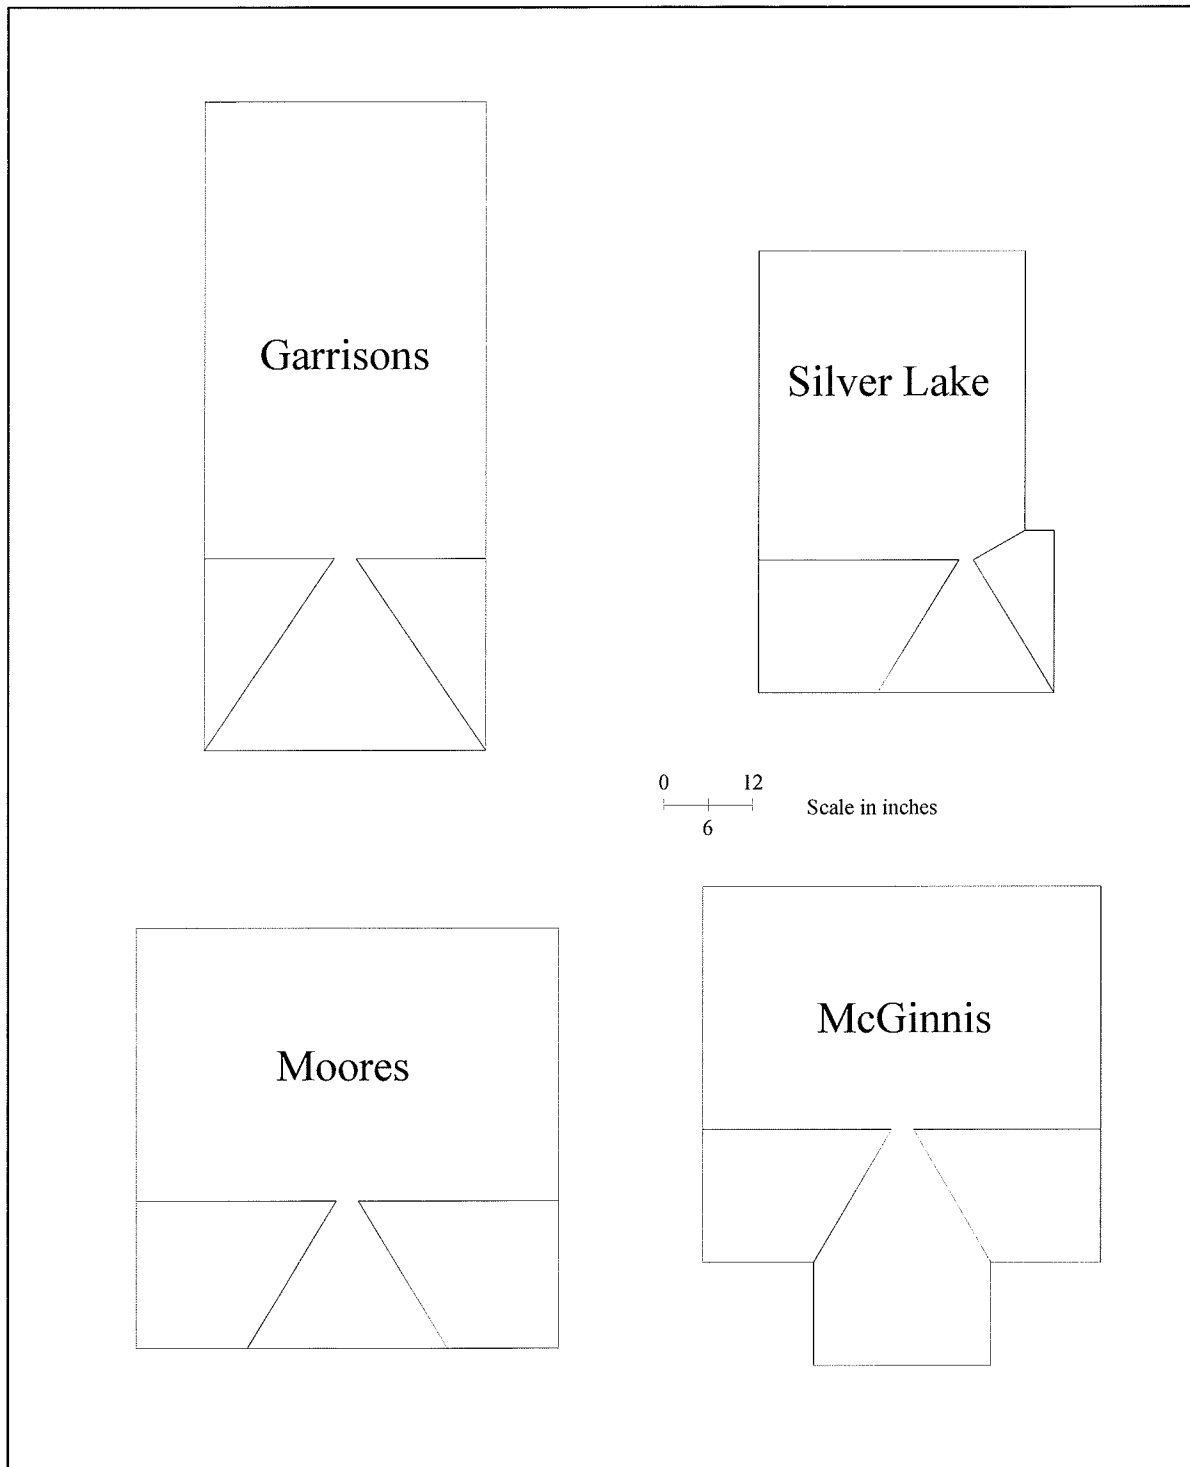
Plan views of four fish traps used to collect fish at the exit (upper end) of the fish ladders.
